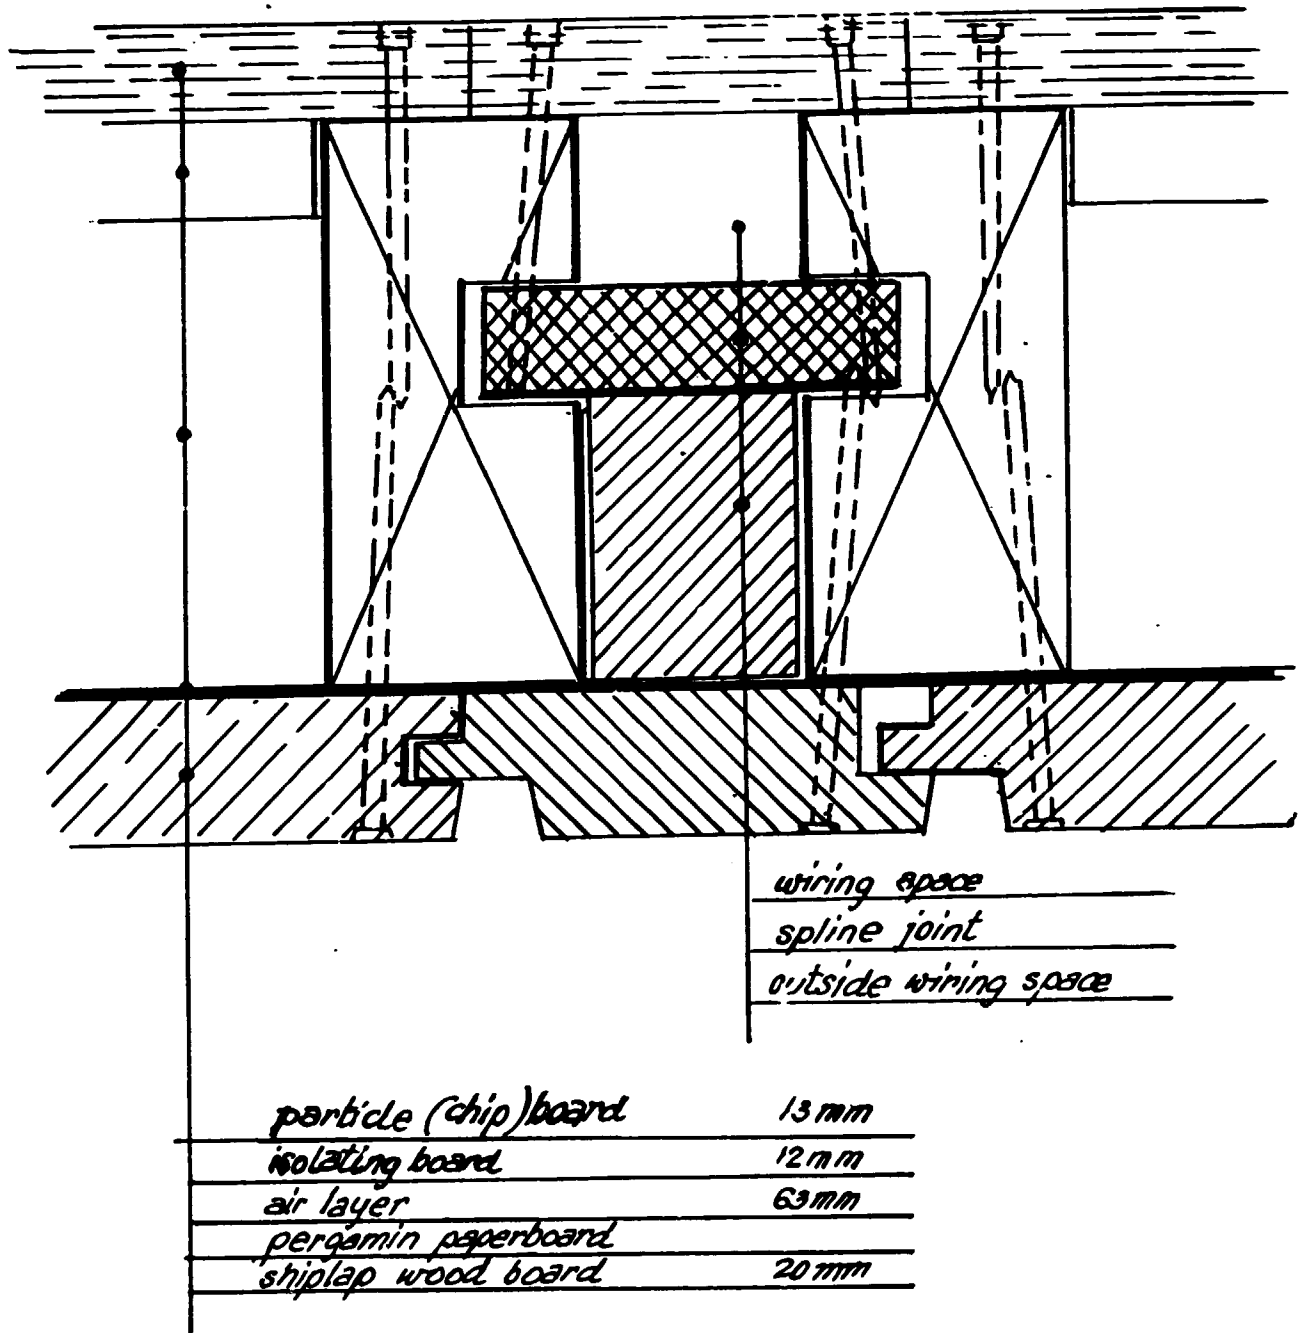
Typical connection between two outside (load bearing) wall elements.
